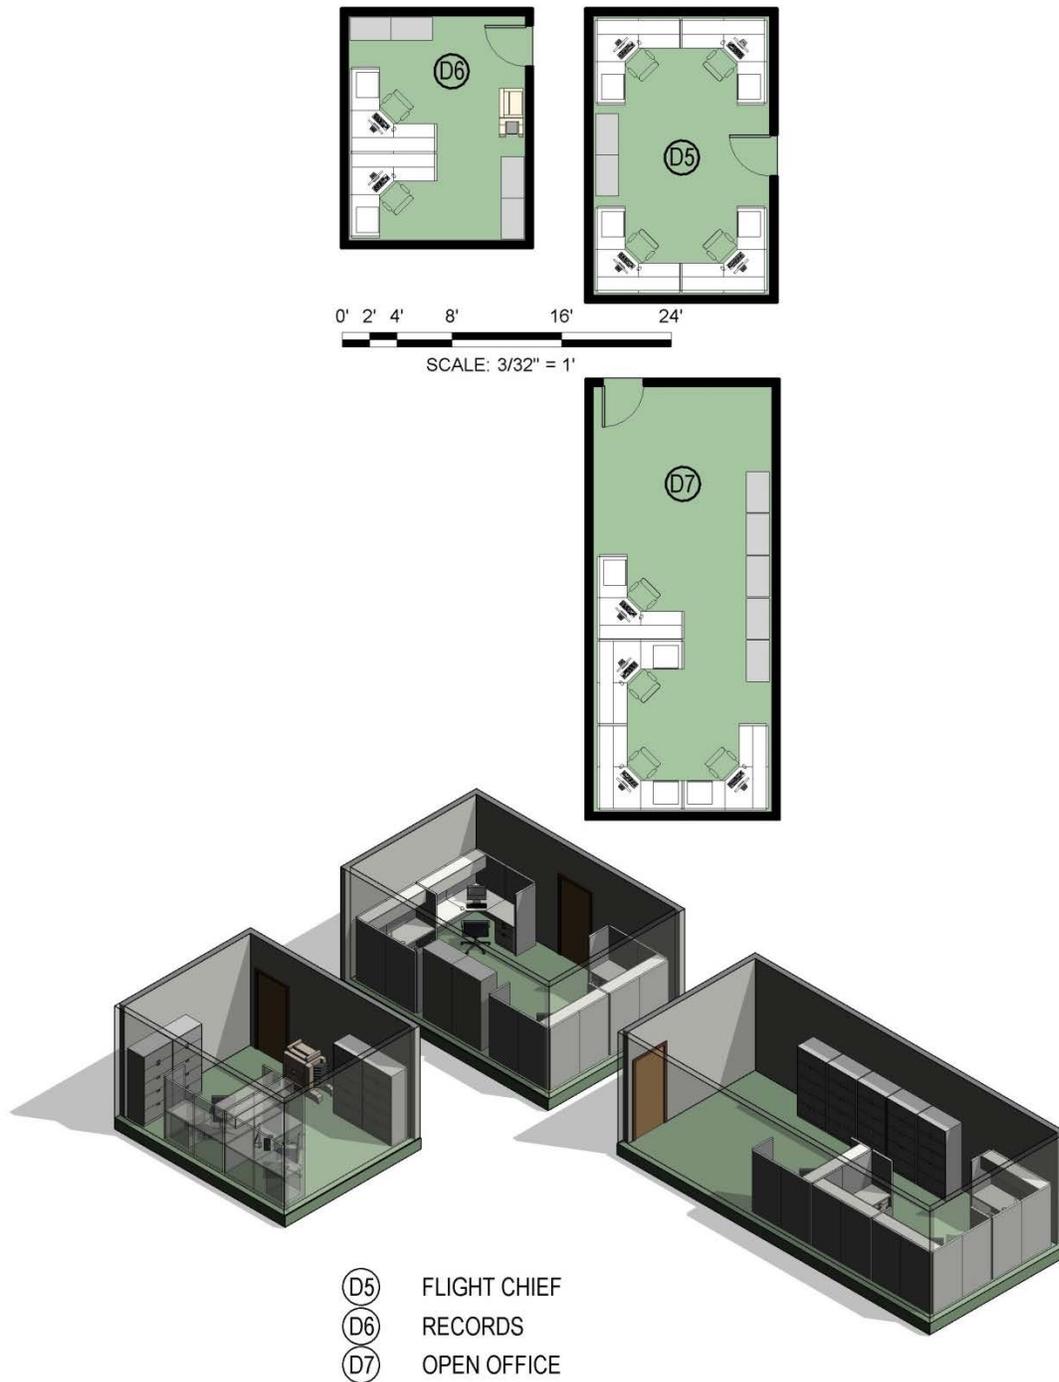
Module D Floor Plan & Axonometric (2 of 2)
